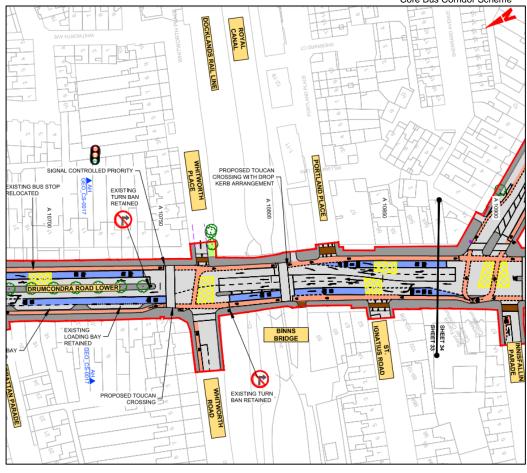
Extract from General Arrangement Drawing (Sheet 33)
